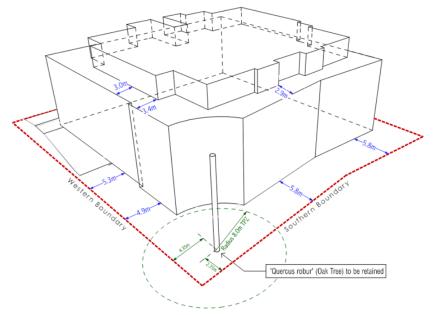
Indicative building envelope with minimum building setbacks indicated (south-west view)
